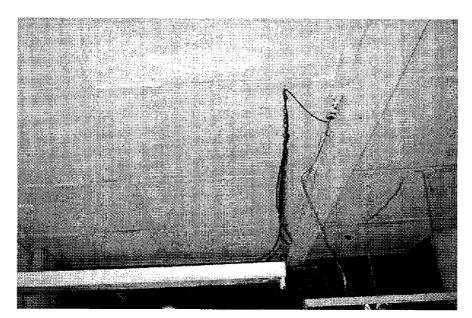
Example of asbestos cement sheeting located on the ceilings of the northern most rooms of the commercial tenancy at 89 Liverpool Road.
